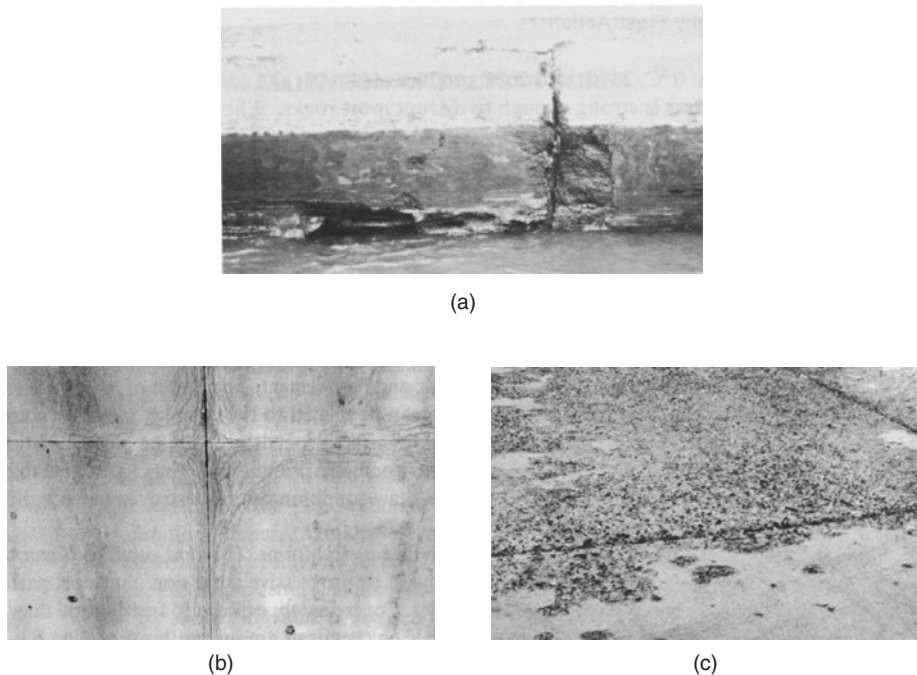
Types of frost action damage in concrete: (a) deterioration of a non-air-entrained concrete-retaining wall along the saturation line (Lock and Dam No. 3, Monongahela River, Pittsburgh, PA); (b) severe D-cracking along longitudinal and transverse joints of a 9-year-old pavement; (c) scaling of a concrete surface. [(a) Photograph courtesy of J.M Scanlon, U.S. Army Corps of Engineers, Vicksburg, MS); (b) photograph courtesy of D. Stark, from *Report RD 023.01P*, Portland Cement Association, Skokie, IL.,1974; (c) photograph courtesy of R.C. Meininger, from *Concrete in Practice*, Publ. 2, National Ready Mixed Concrete Association, Silver Springs, MD.]
